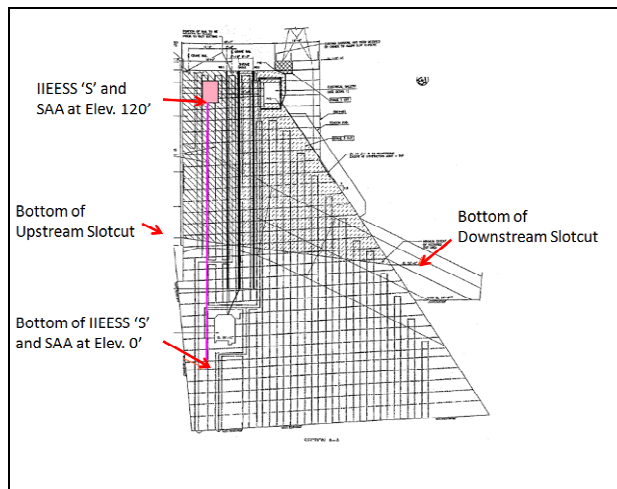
Cross Section of Dam at Inverted Pendulum and SAA Test Site
